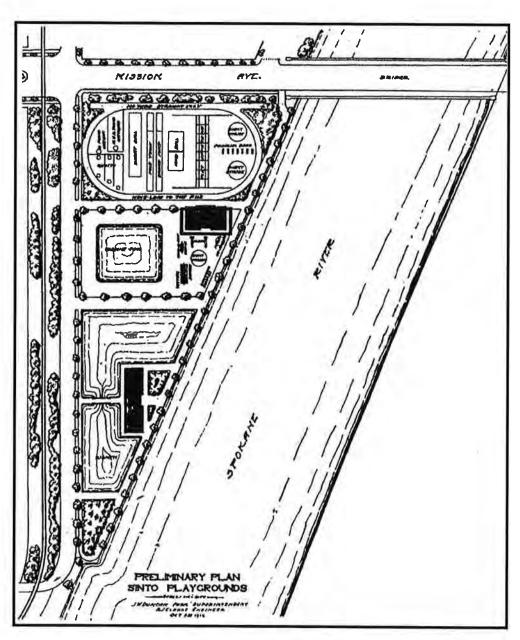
Plan view map showing preliminary plan for Sinto Playgrounds (adapted from Spokane Parks Board 1913).
